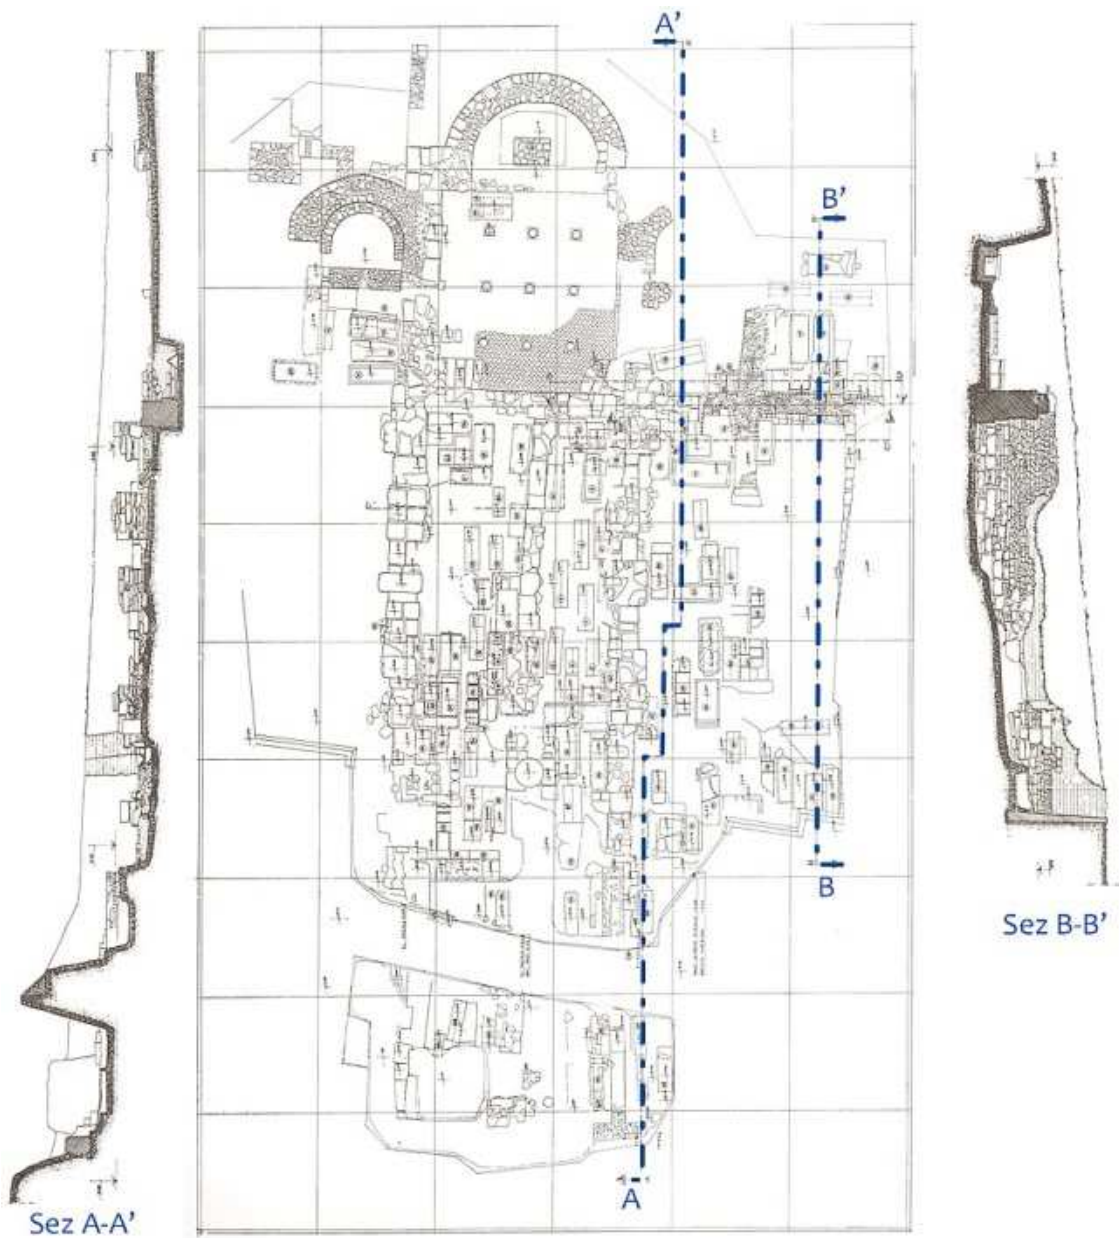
Planimetry elaborated during the excavation of the 70s (Copyright: Alessandra Melucco Vaccaro)
